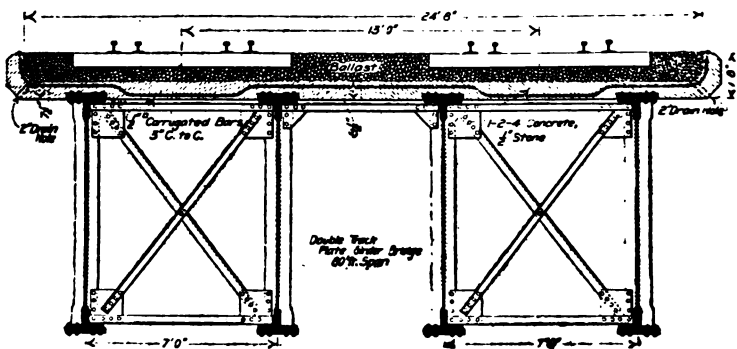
Floor for Deck Bridges, C., B. & Q. R.R.
